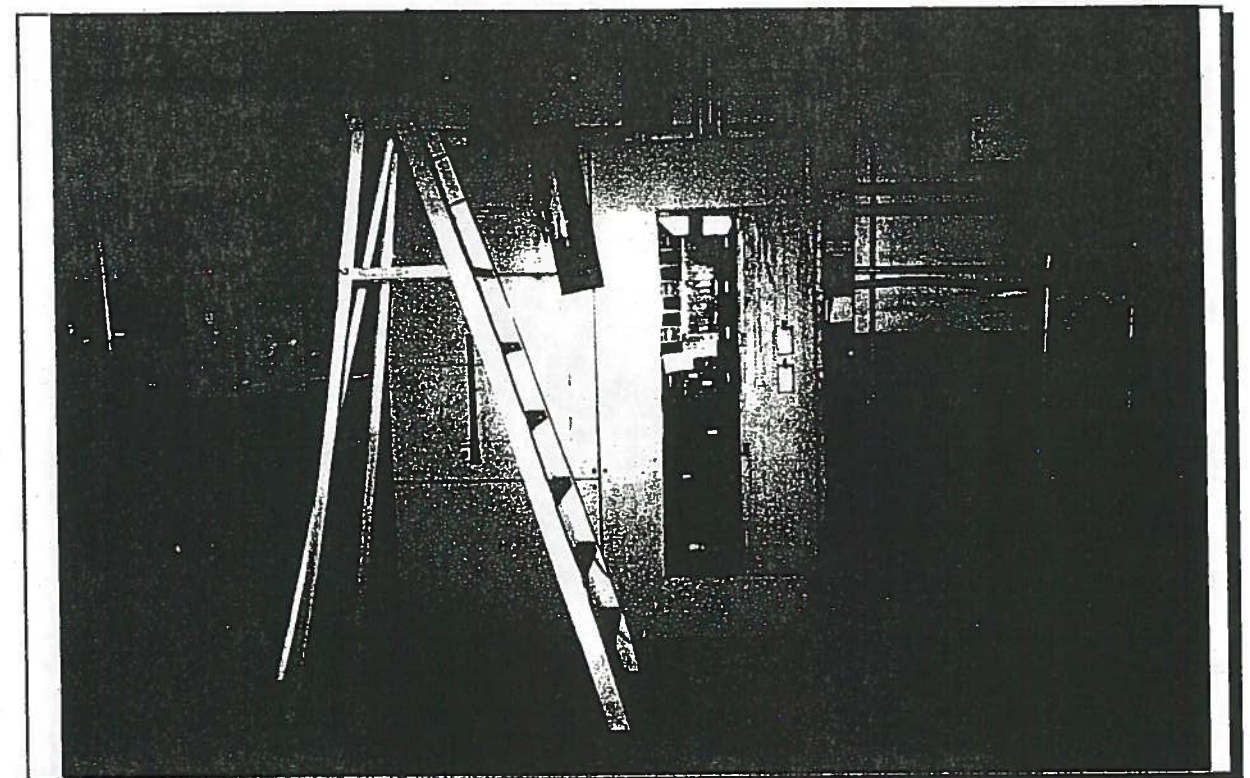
Inside view (ground floor level) of the 22 Flint Street building, showing the building's electrical circuit breaker. This is believed to be the "switch gear" referenced in the Phase I Report by N.W. Haran.
